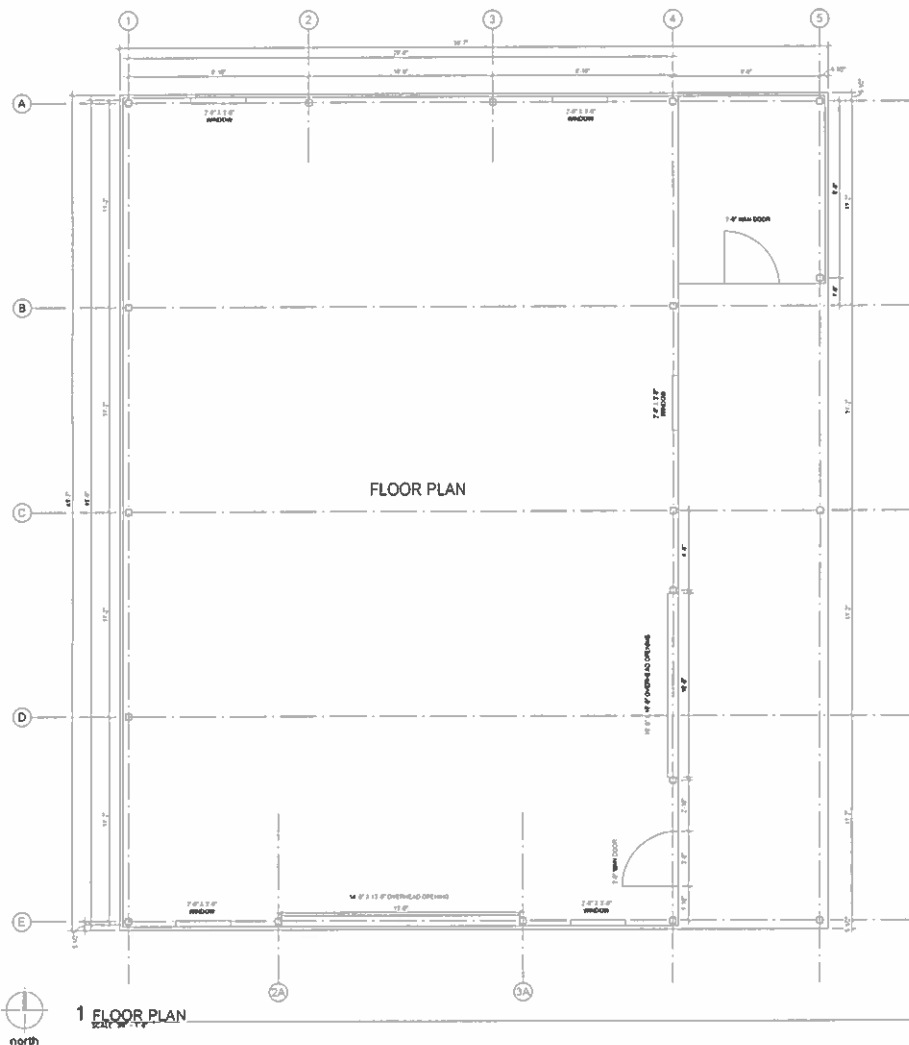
EXHIBIT C - FLOOR PLAN & EXTERIOR ELEVATIONS
